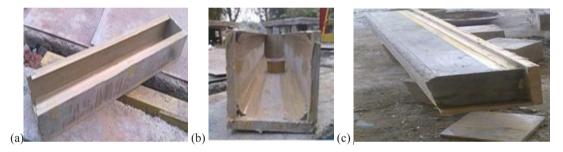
(a) Formwork for column with corner radius 20 mm, (b) Completed formwork with corner radius patty and (c) Formwork with cast specimen.
